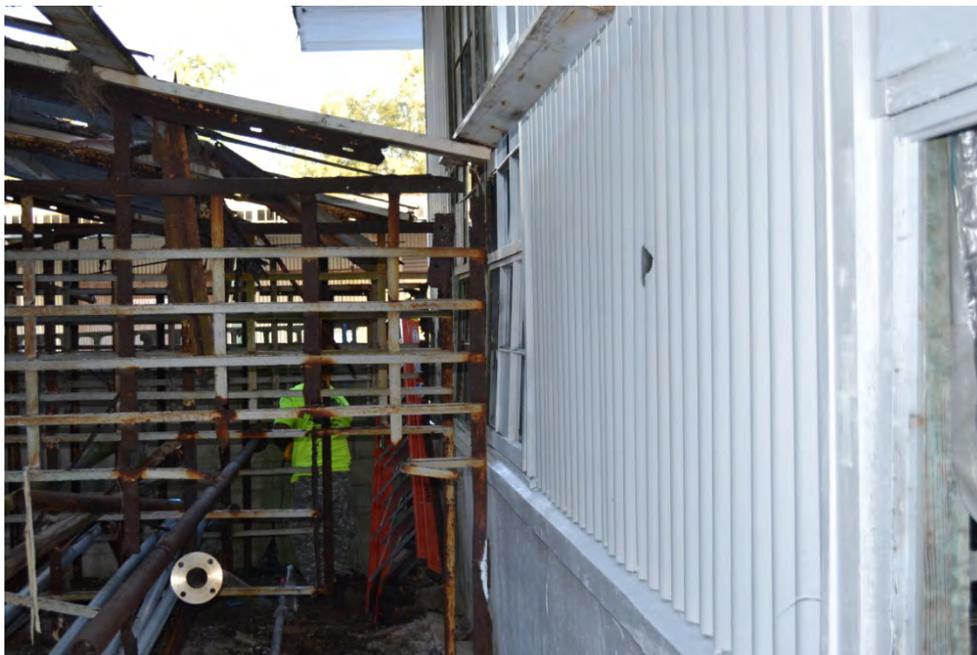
Iniki cut a portion of the pipe rack out to allow for man access for abatement / painting purposes.
